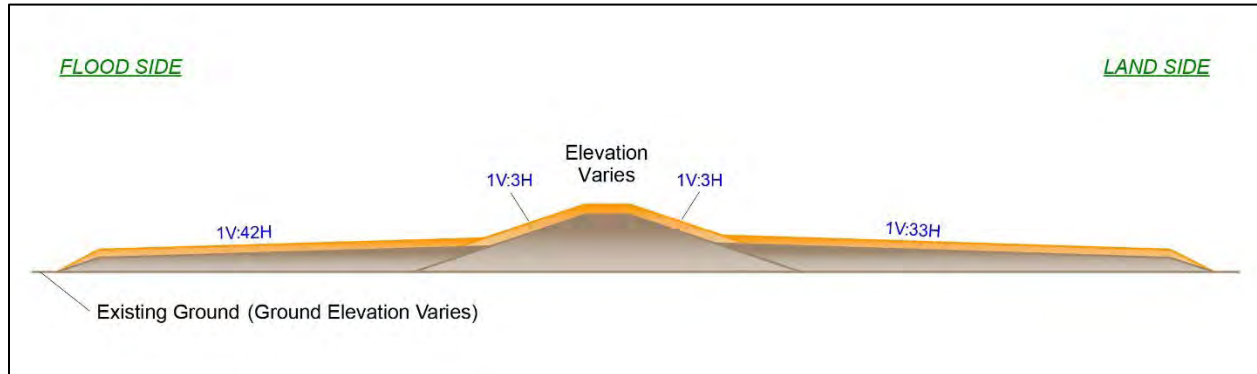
Typical Cross-section with berms for First and Second Lifts for West Slidell
